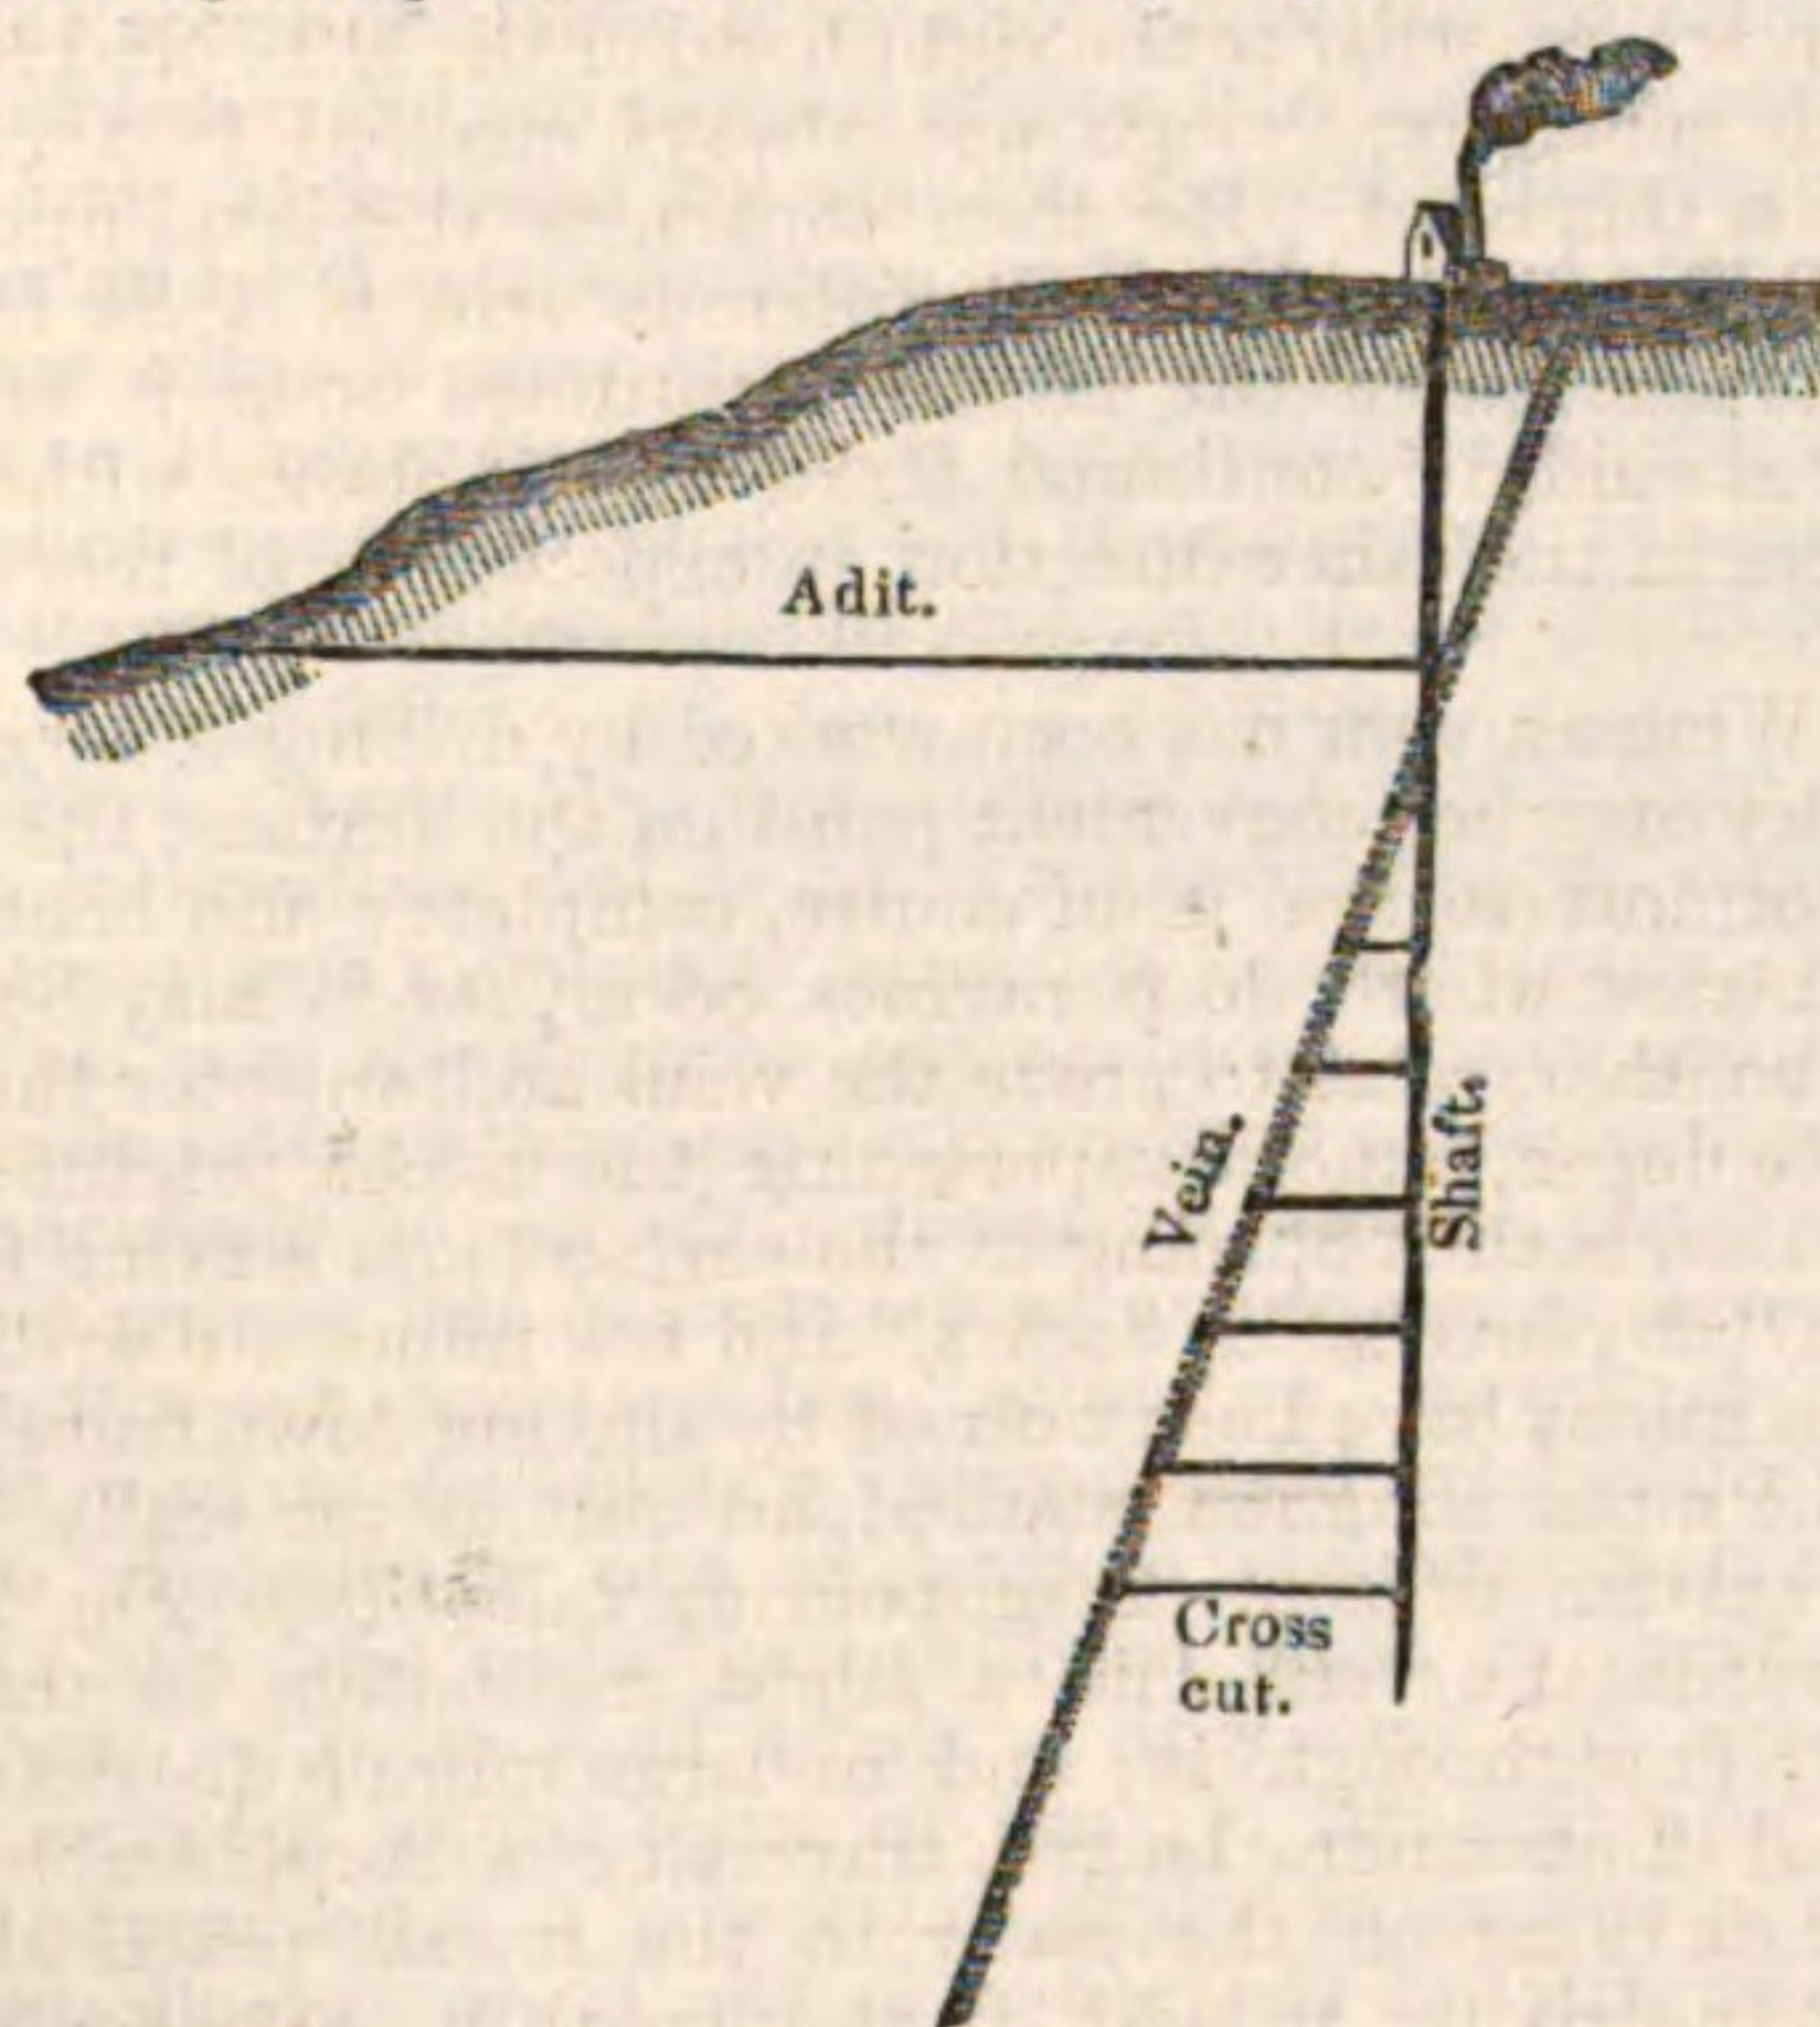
Cross Section, showing the progress of a shaft after cutting the vein.
